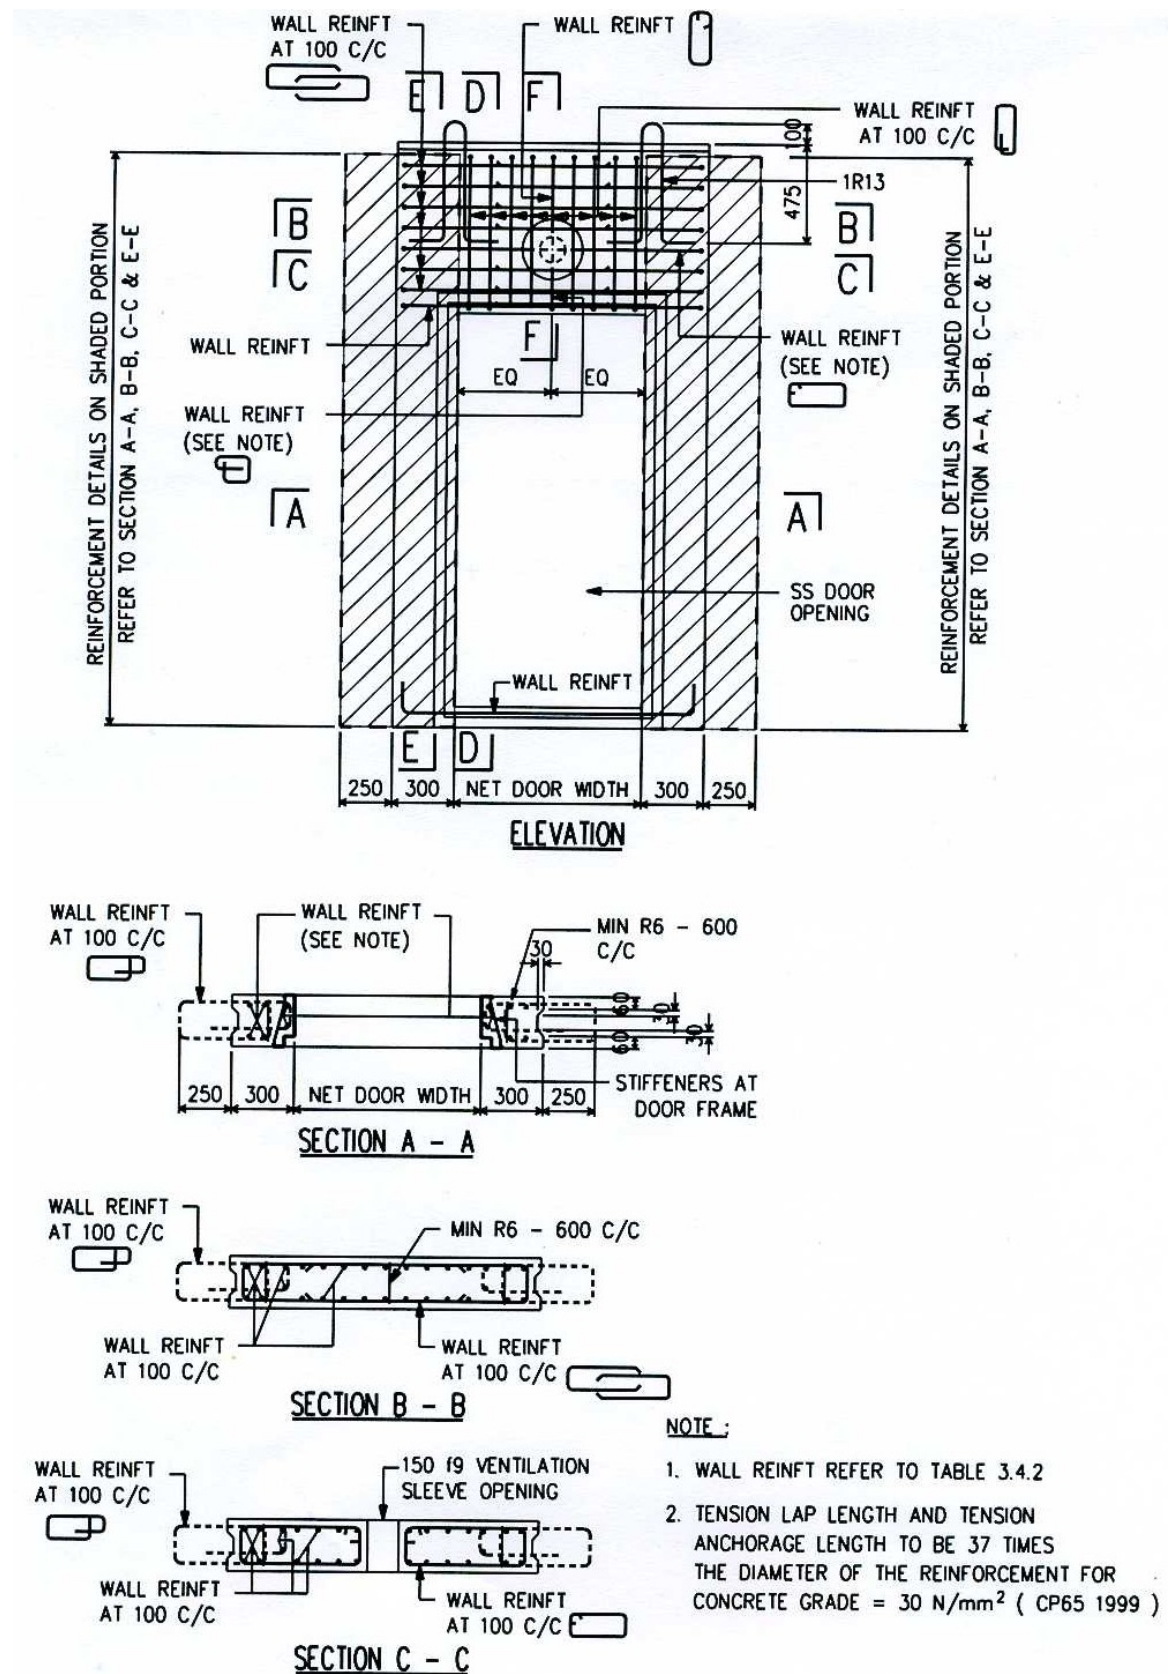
(j) DETAILS OF PRECAST SS DOOR FRAME PANEL (TYPE 1)
